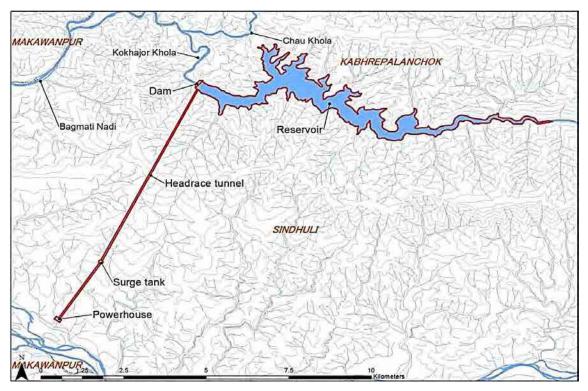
General Layout of Kokhajor-1 Project (E-06)
